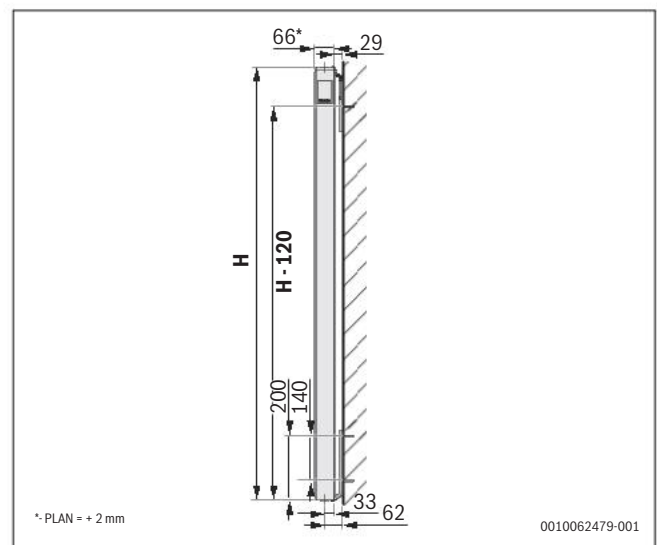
Installing radiators types 21 for CV Profil/ Plan.2
